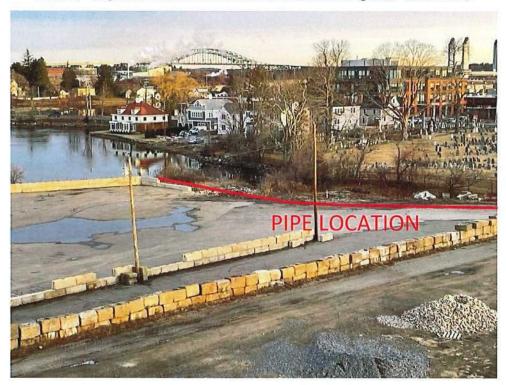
Looking northwest at outfall and 90 Maplewood Ave LLC lot area (left). Picture taken from Foundry Parking Garage.
